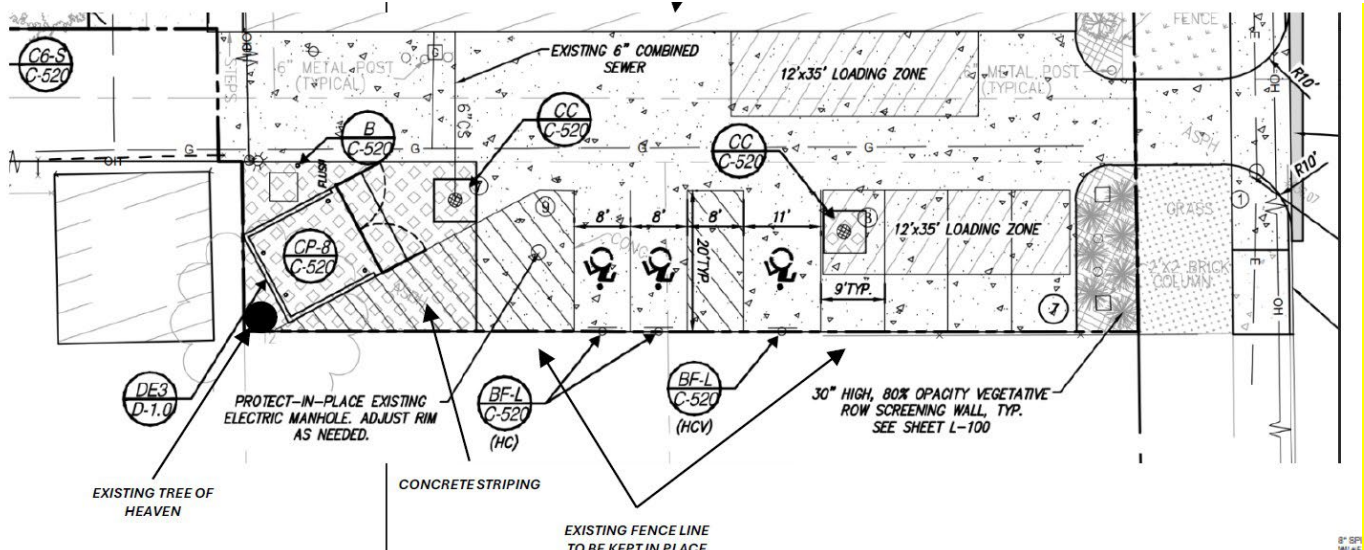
Proposed site plan, showing trash enclosure and concrete parking area.
